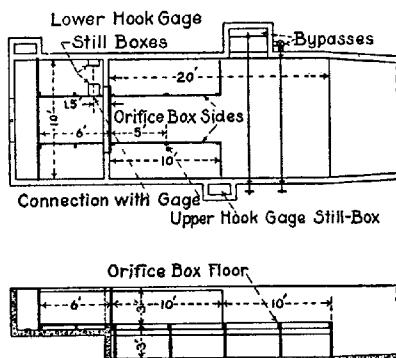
Plan, elevation, and section of orifice box in concrete channel.
